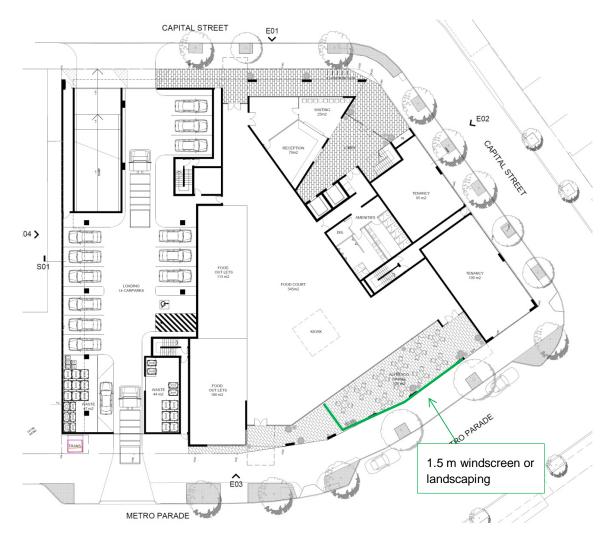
Schematic plan view of the ground floor with recommended wind control measures
